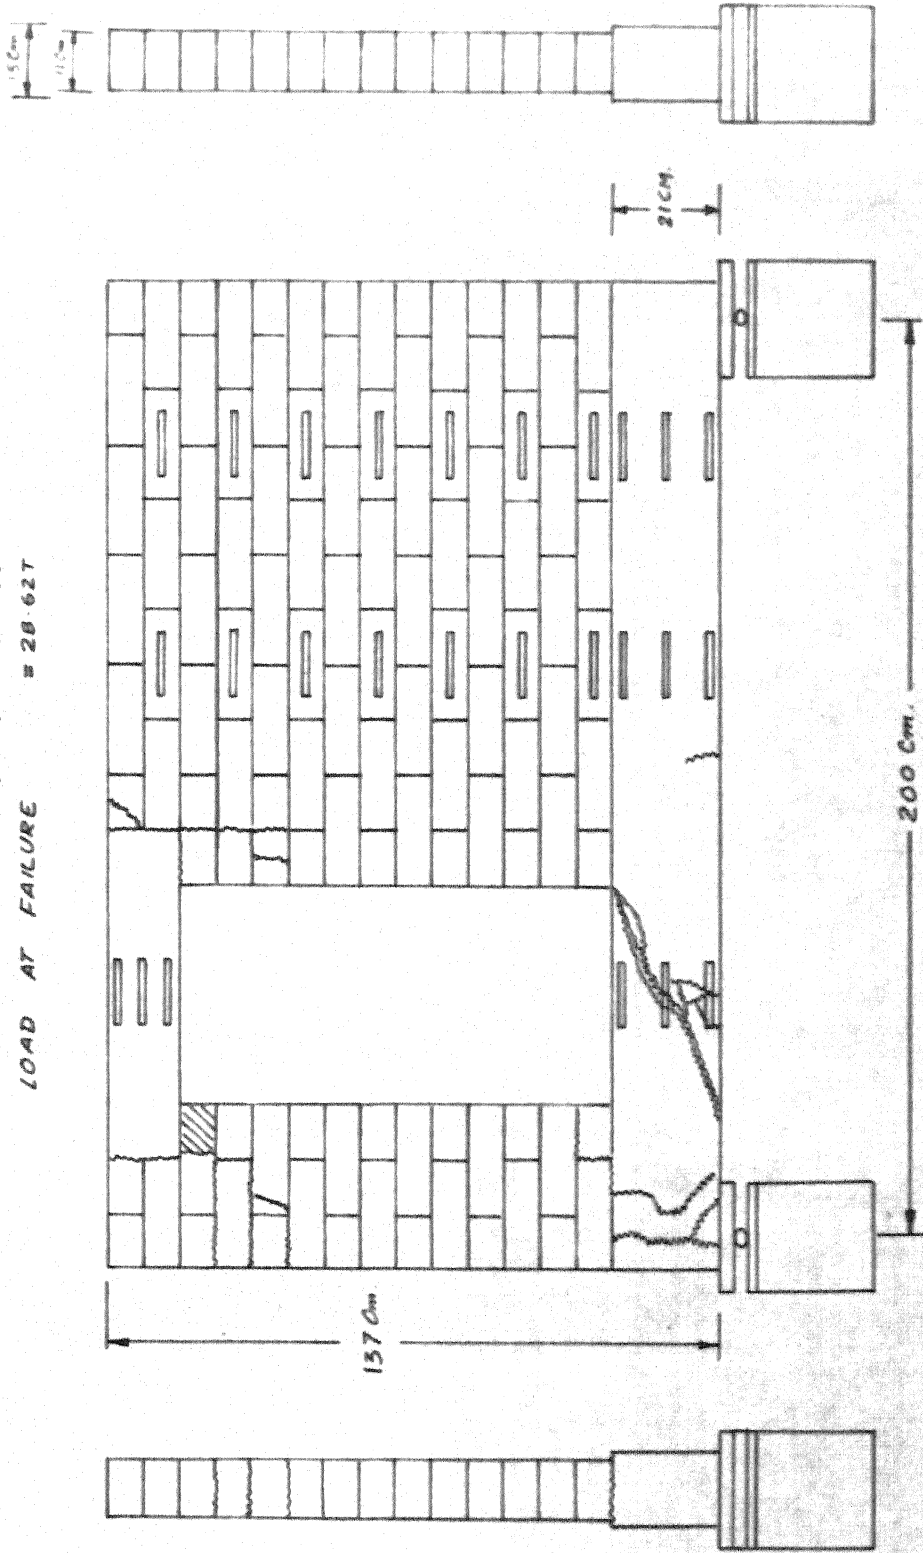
CRACK PATTERN AT FAILURE BEAM_C 3
